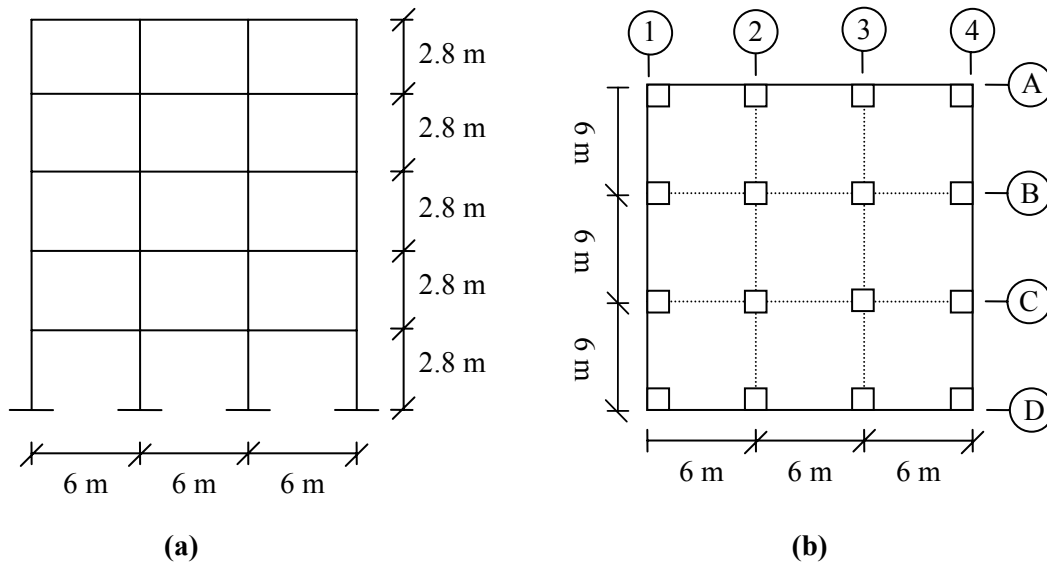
Five-Story Flat-Slab Building, a) Elevation, b) Plan
